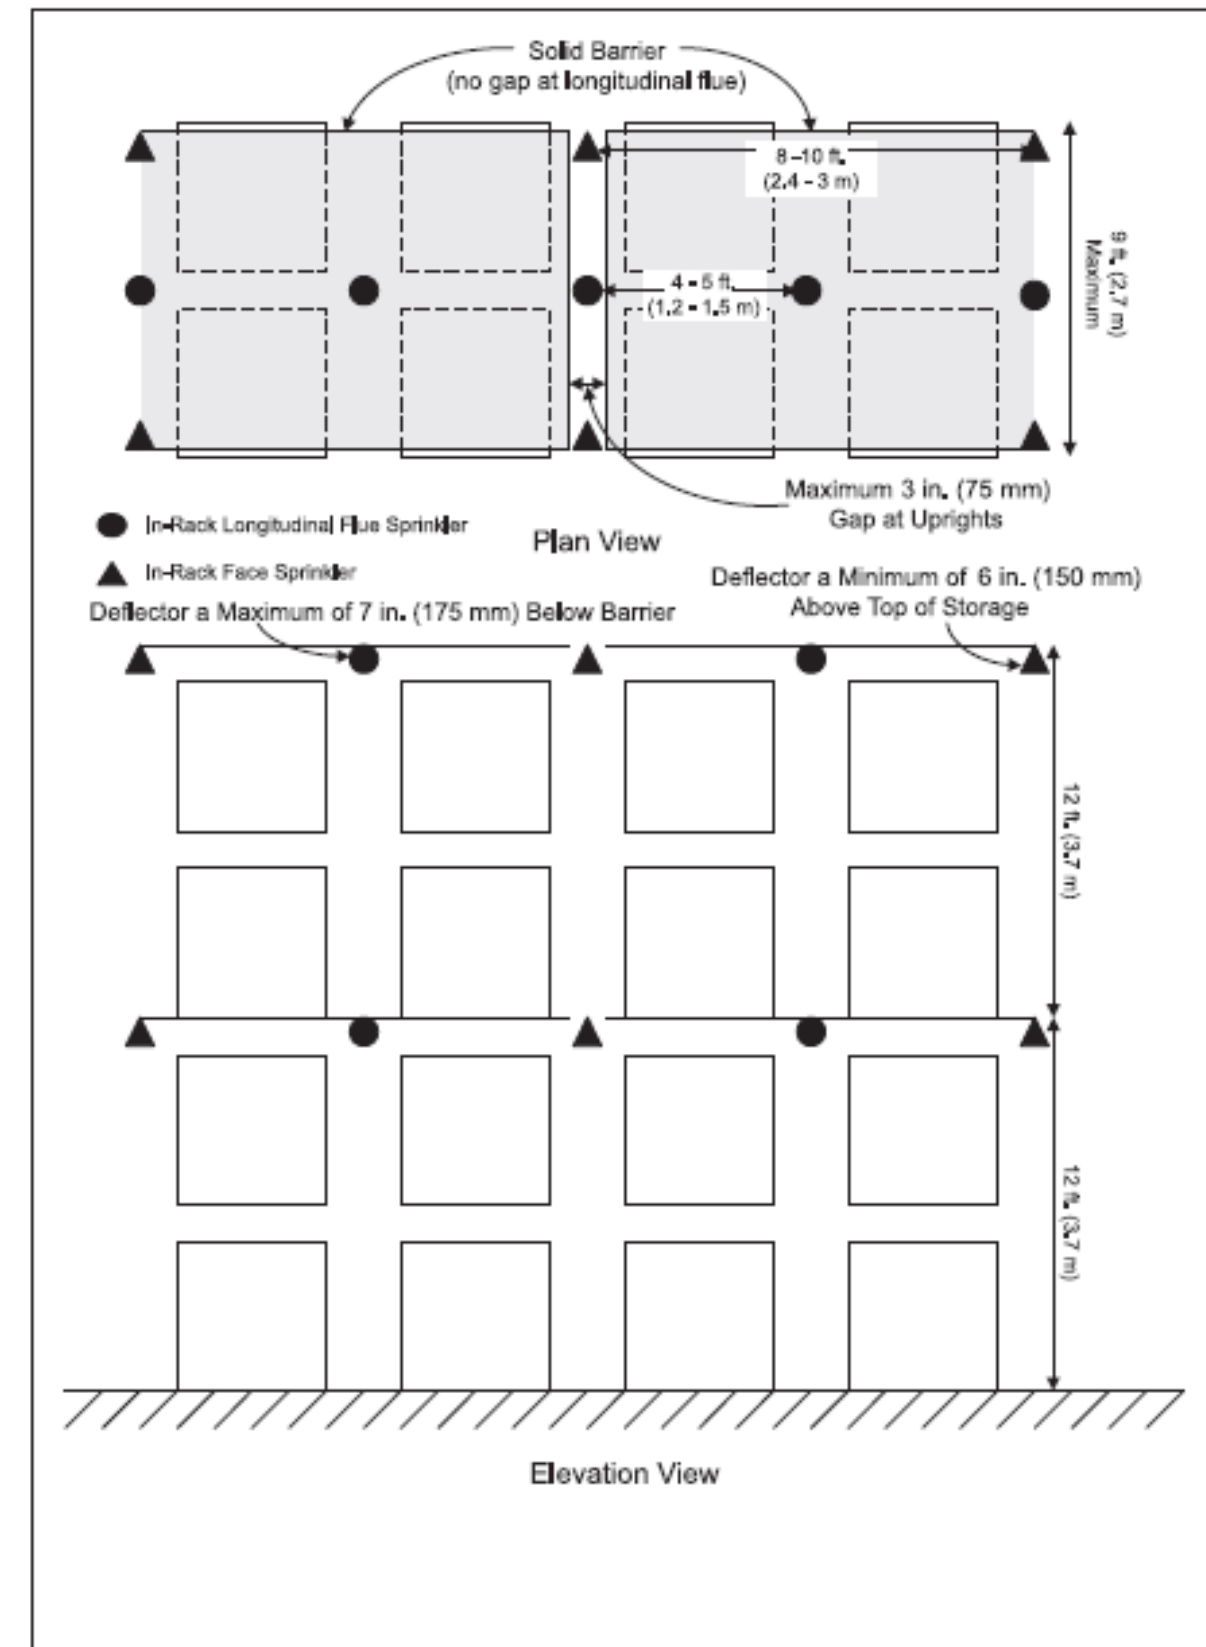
Double-row rack sprinkler layout: fire protection scheme A
